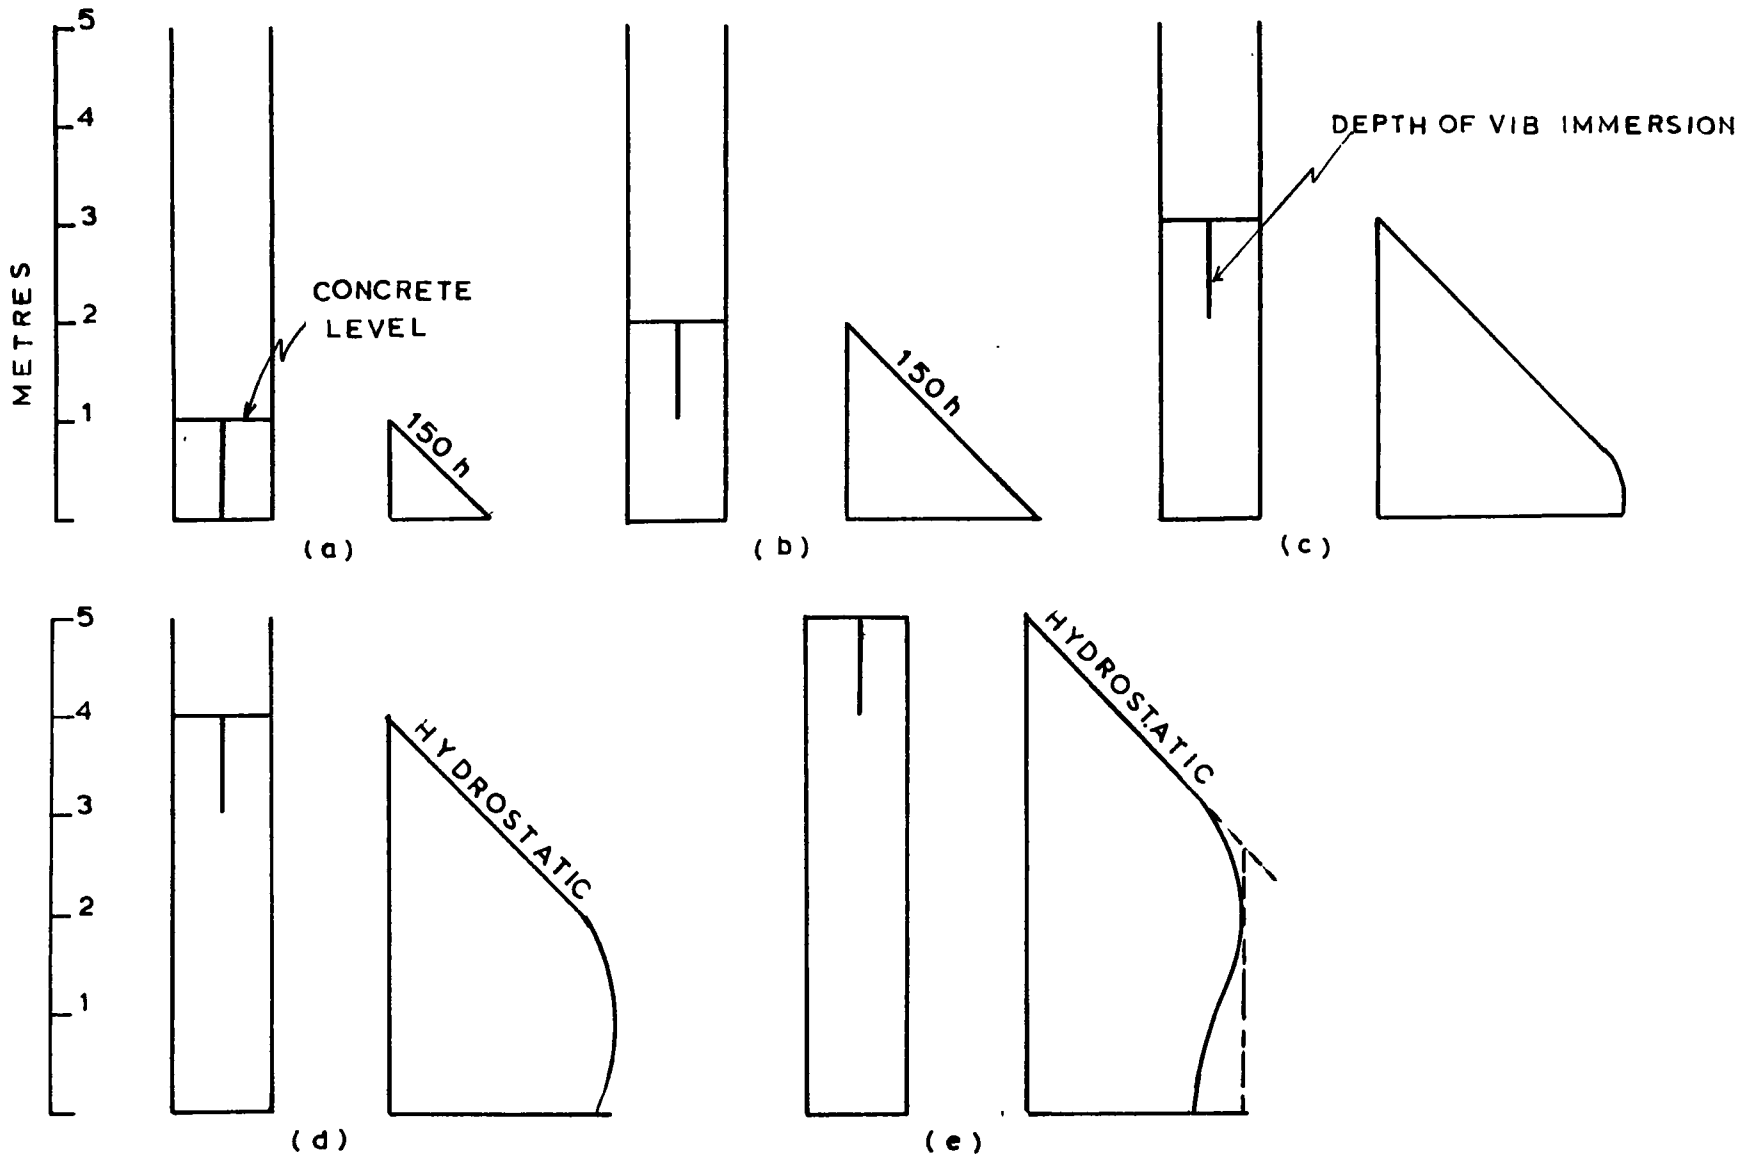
LATERAL CONCRETE PRESSURE ENVELOPE UNDER VARYING CONCRETE HEAD
